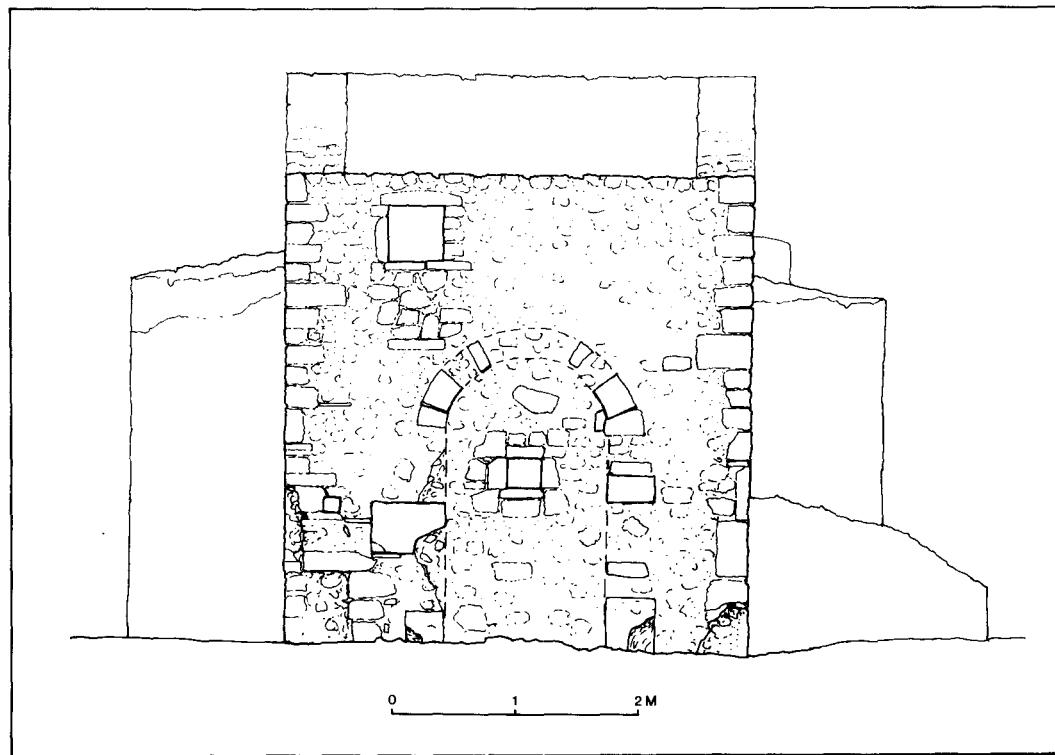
An elevation of the west front of the chapel. (Drawn by Sheila Gibson)
